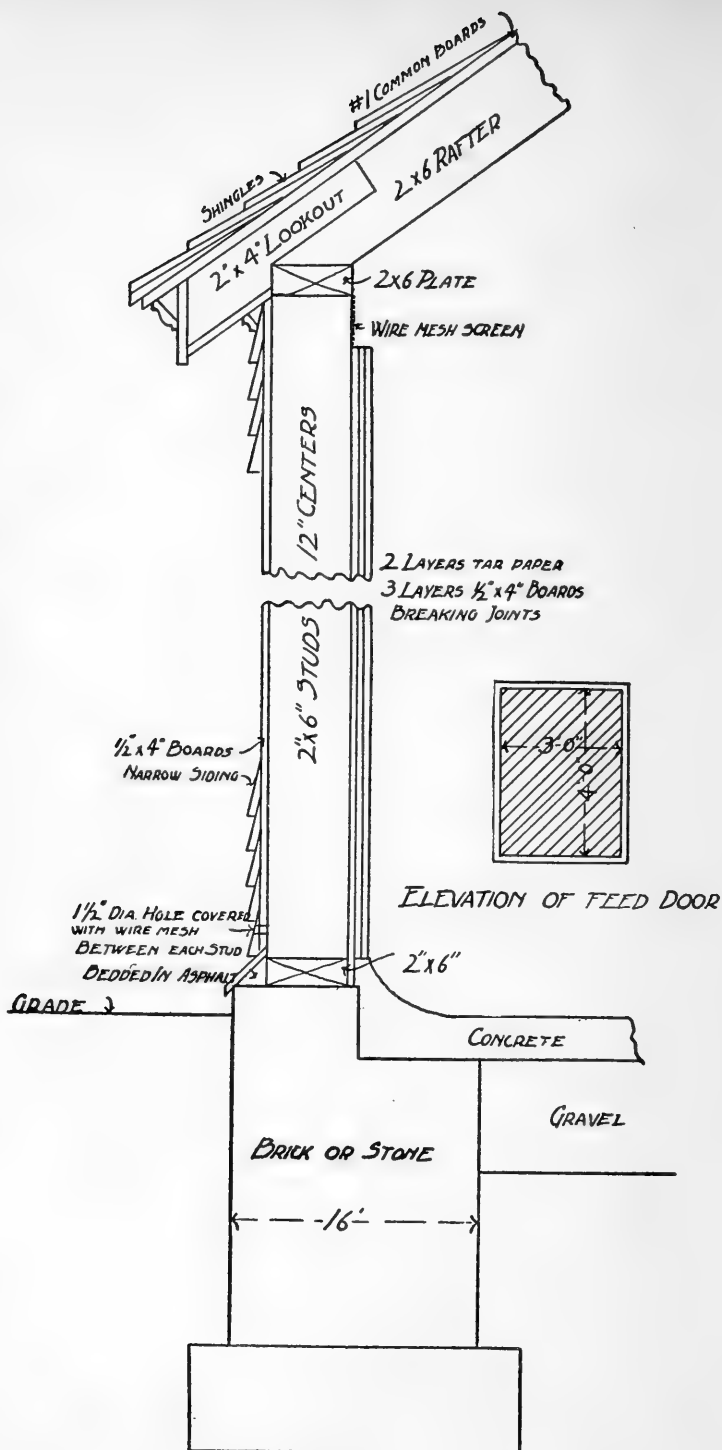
SECTION THROUGH WALL OF ROUND WOODEN SILO.
